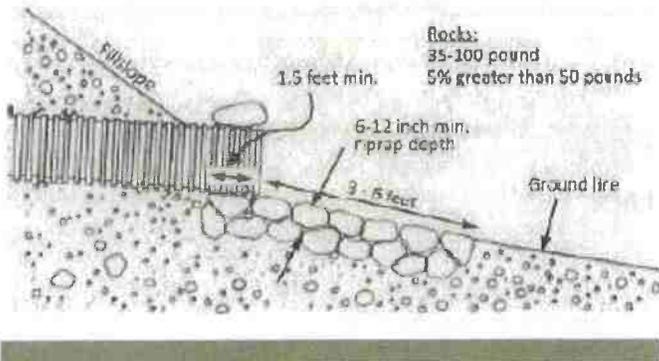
A. Riprap armor at culvert outlet (Modified from: Keller et al., 2011).
